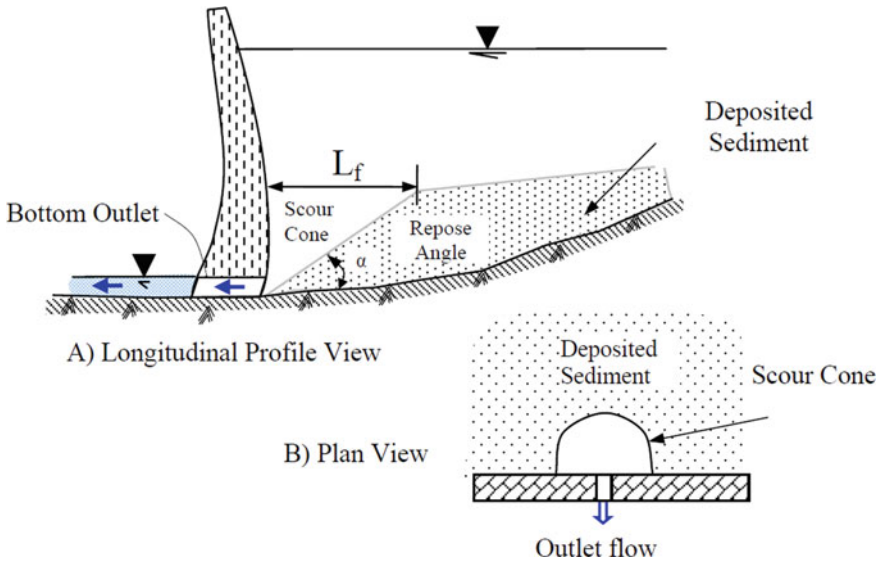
Plan and longitudinal view of the pressure flushing (Emamgholizadeh et al., 2006)
